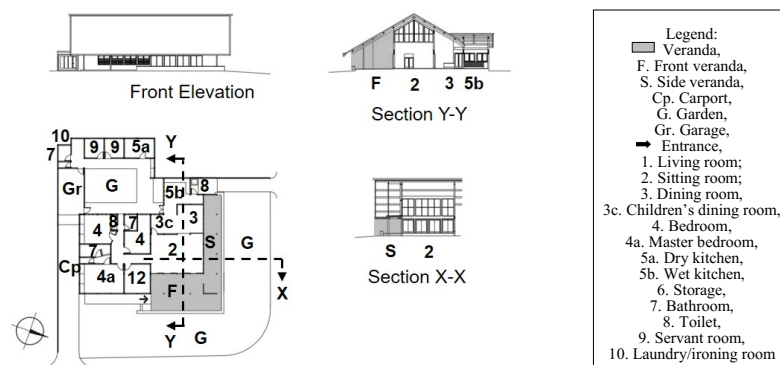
Private house of J.M. Minister of Air Force of the Republic Indonesia (around 1962-1967)⁴⁾
